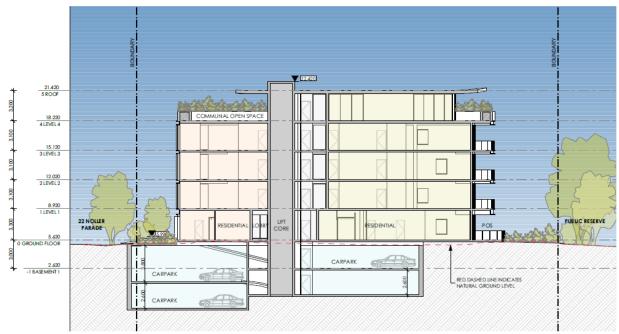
Indicative design elevation of 22 Noller Parade, Parramatta from the east
